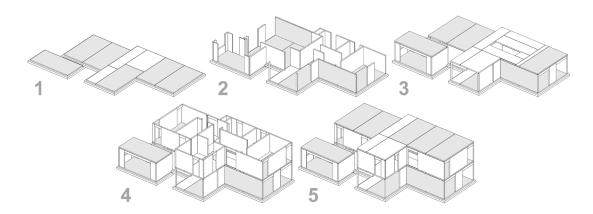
Plans of the Mehrow house. Adapted from Conclus (n.d.).
